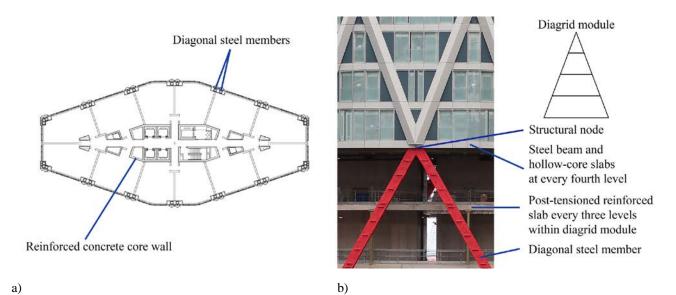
a) Newfoundland Tower in London, floor plan (figure by I. Cała); b) Newfoundland Tower in London, diagrid structure (photograph and figure by A. Jóźwik).
